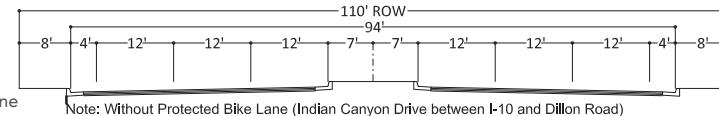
CITY OF DESERT HOT SPRINGS GENERAL PLAN ROADWAY CROSS-SECTIONS
